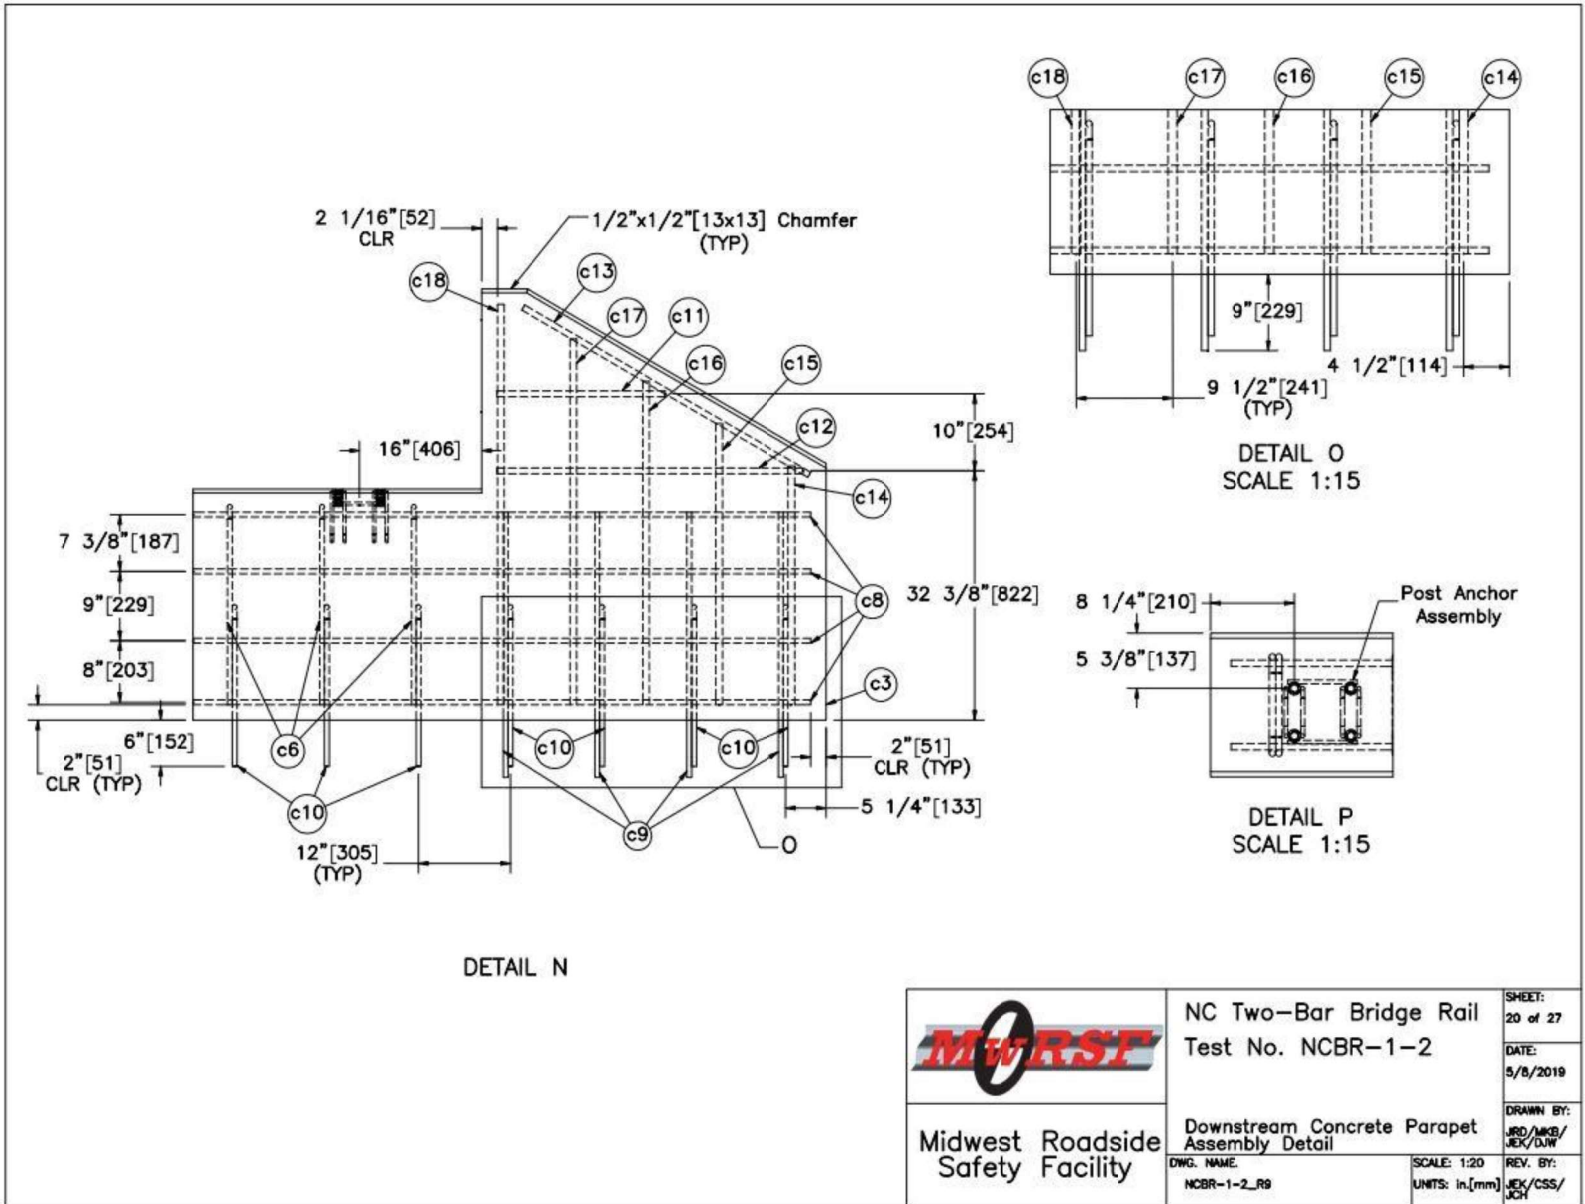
Downstream Concrete Parapet Assembly, Test Nos. NCBR-1 and NCBR-2
